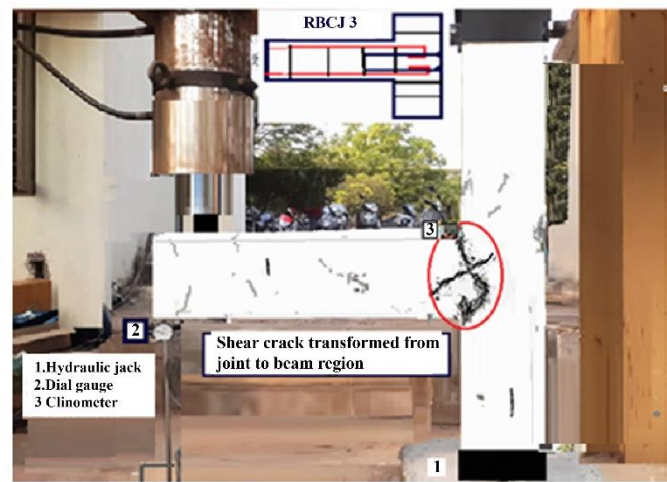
(b) Testing of Retrofitted 180 degree hook anchorage RBCJ3
